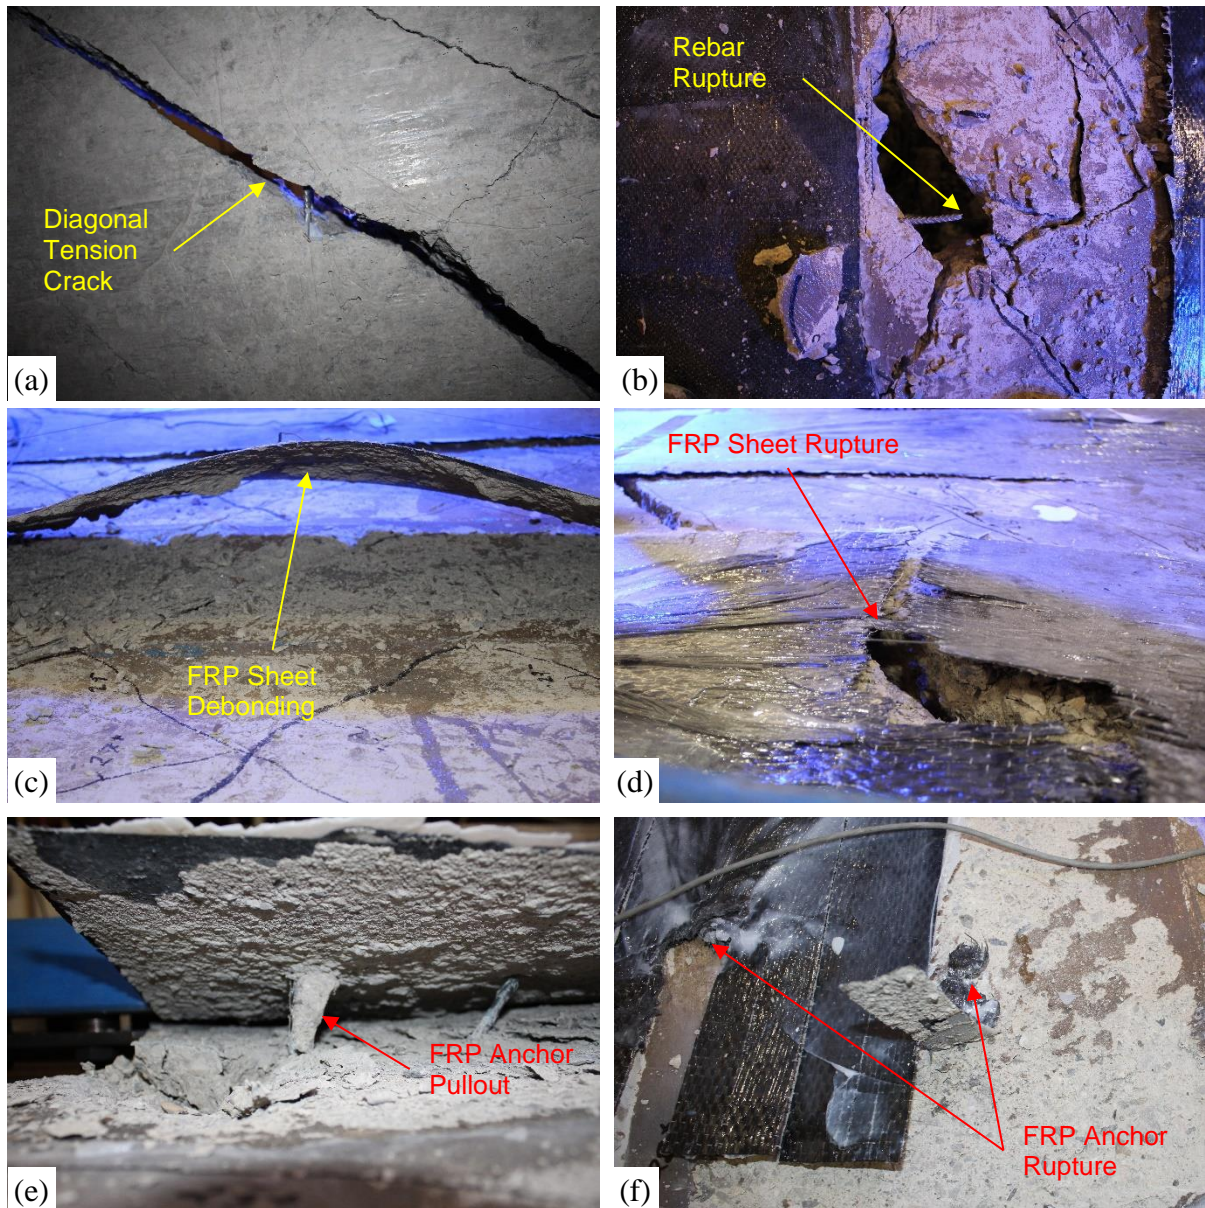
Typical Failure Modes: (a) Diagonal Tension Crack; (b) Rebar Rupture; (c) FRP Debonding; (d) FRP Rupture; (e) Anchor Pullout; (f) Anchor Rupture.
